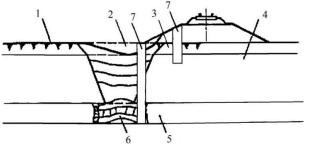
Diagram of earthwork stabilization on areas with settling above mines: 1 – day surface; 2 – collapse funnel; 3 – disperse soil; 4 – primary rocks; 5 – minerals; 6 – mined-out space; 7 – columns of reinforced soil
